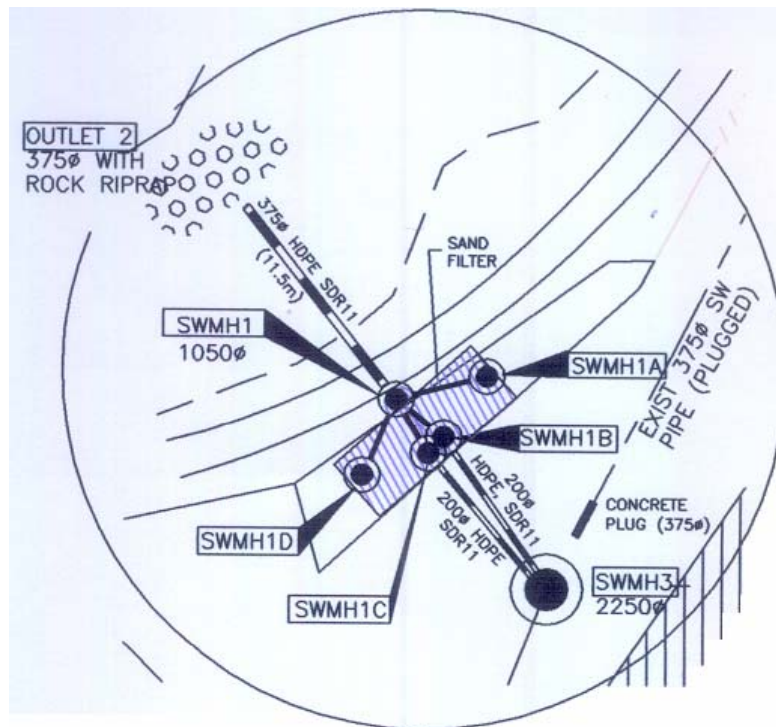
Schematic plan view of the Pack 'N Save sand-filter arrangement)
